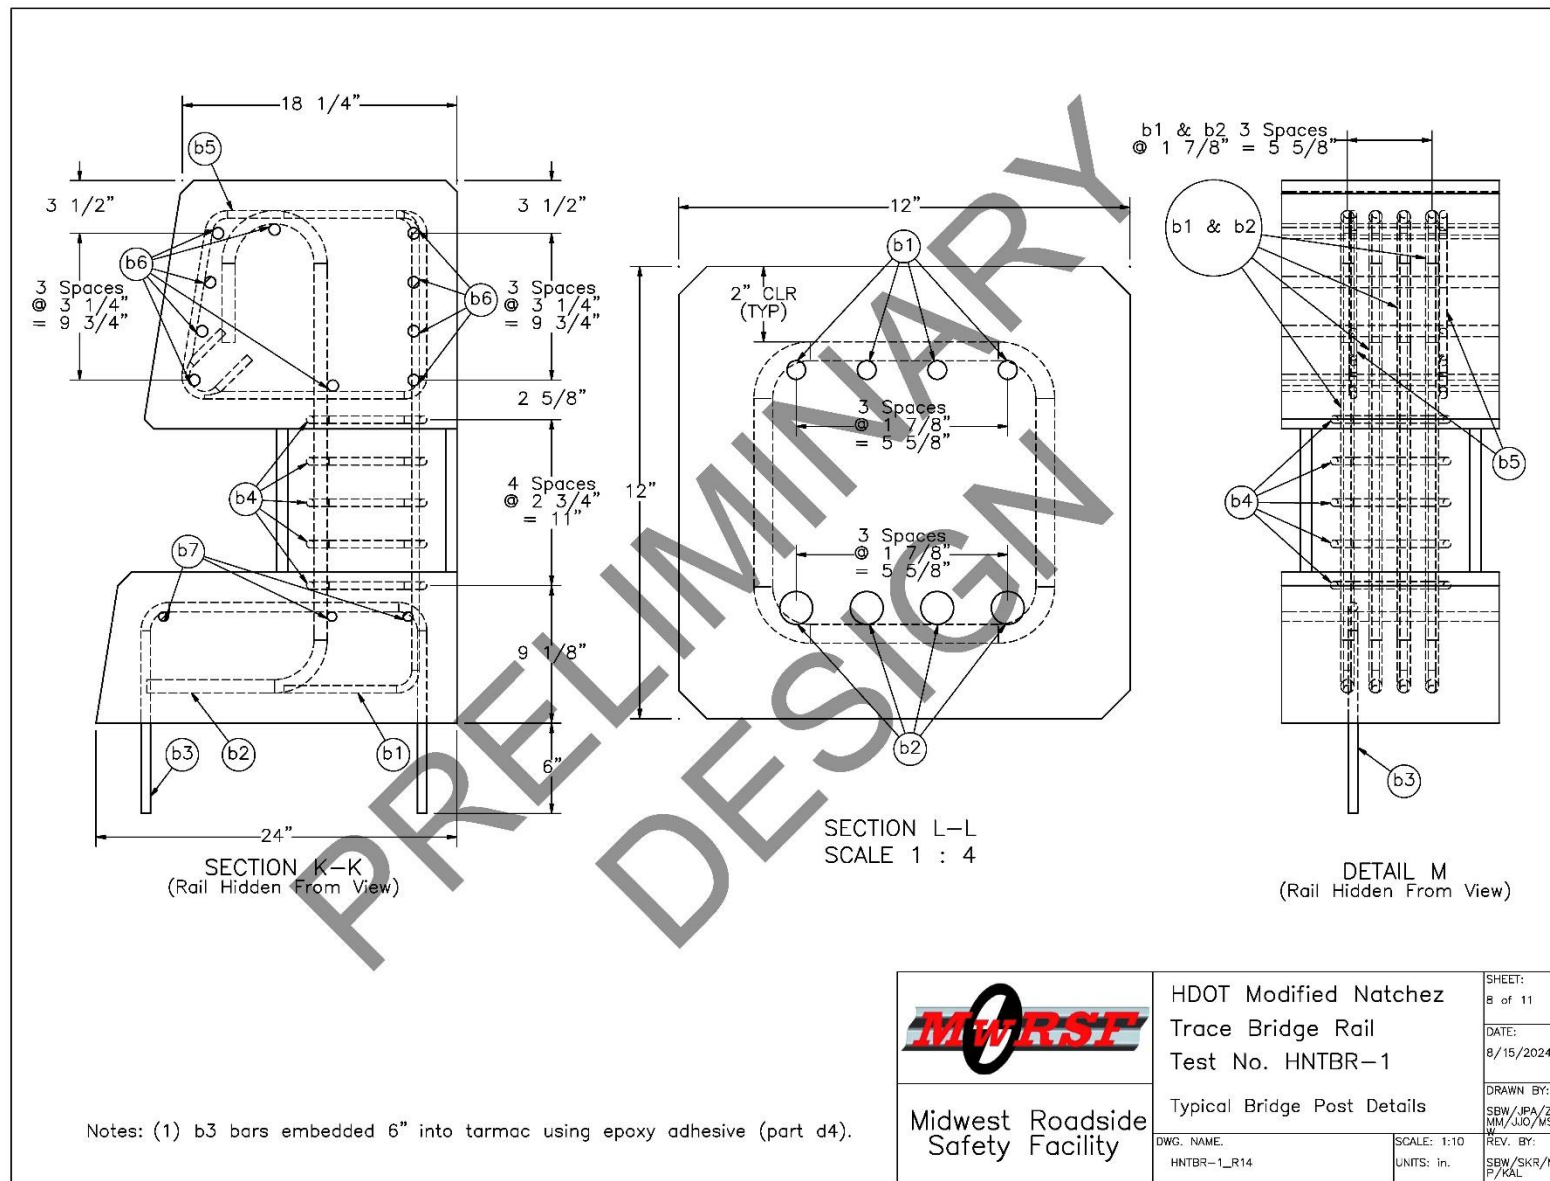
Post-Rail Rebar Arrangement, Test No. HNTBR-1
